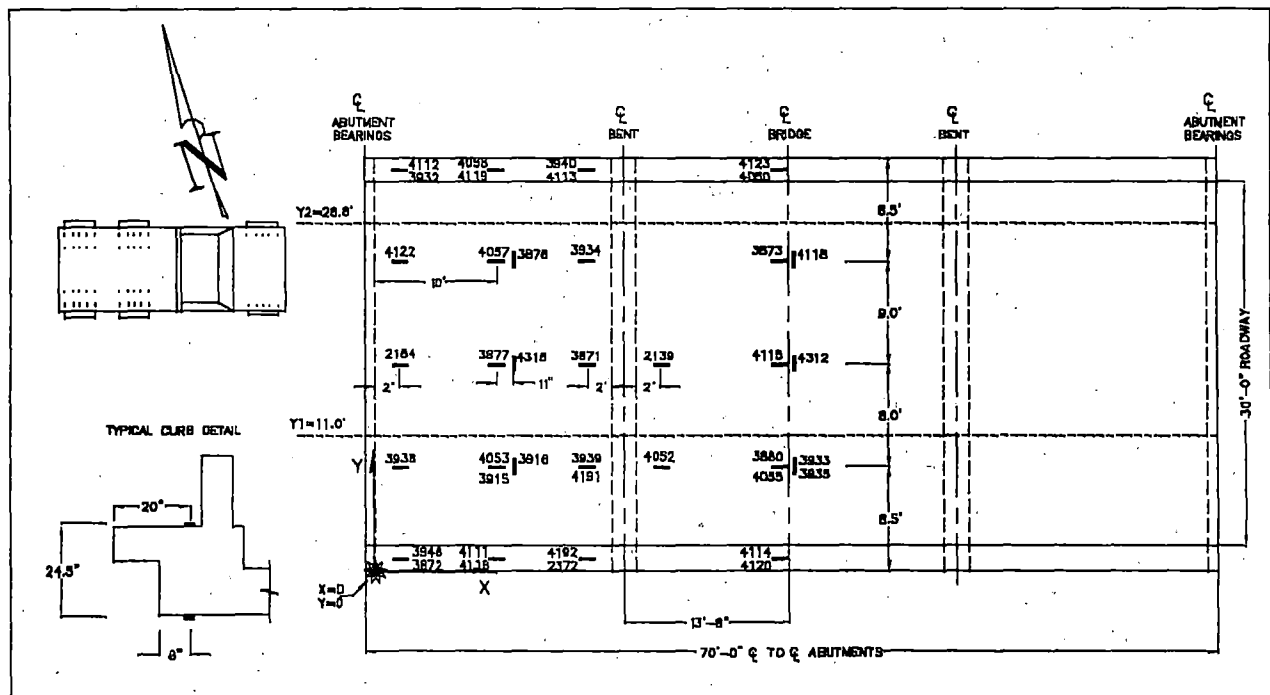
US-20 over Lake Creek - Instrumentation Plan.
